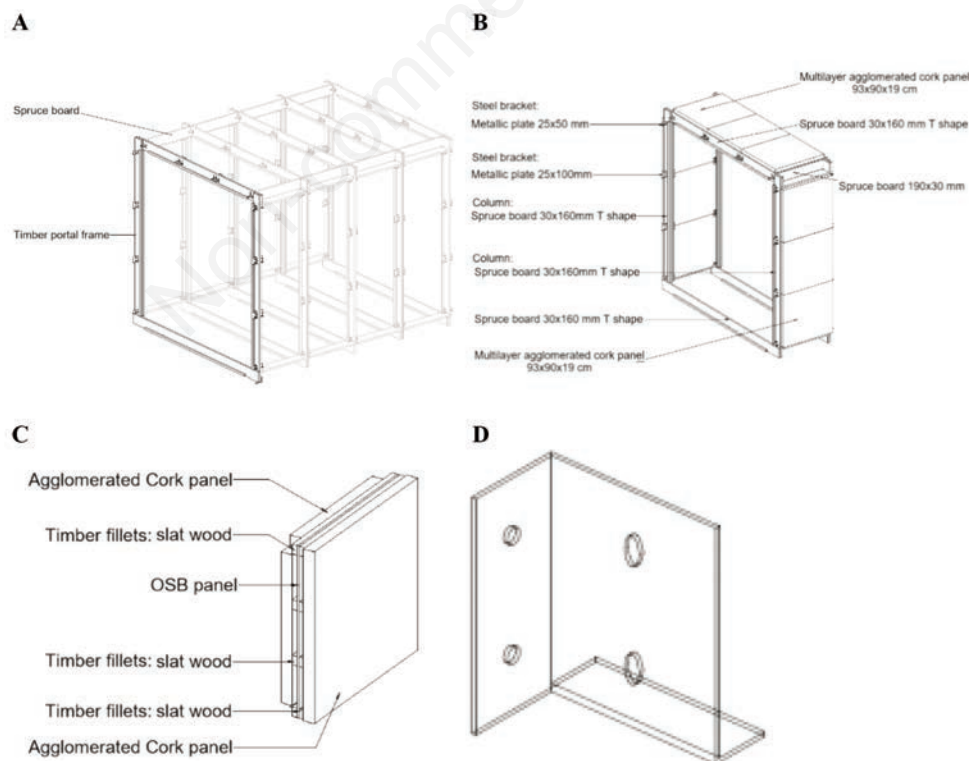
A) Structure of the lightweight temporary shelter; B) timber portal frames with sandwich panels in cork and timber; C) multilayer agglomerated Cork panel; D) metallic plate (steel bracket) to fix the panels to the timber column frame.
